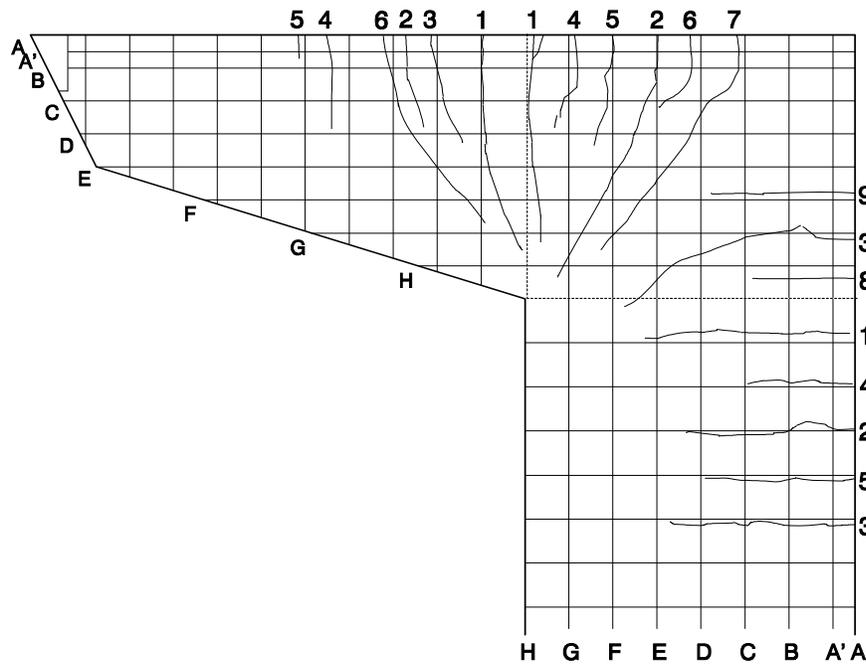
Cracking patterns on south face of Specimen POJ-PU-74-TH at end of test (no failure)
